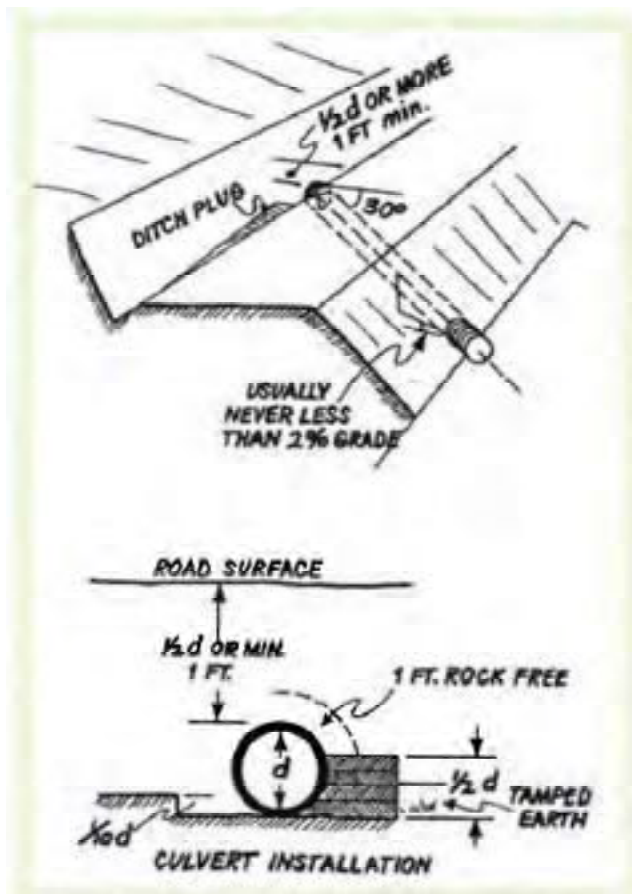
The elements of a properly installed ditch relief culvert. The culvert is angled at about 30 degrees to the road alignment to help capture flow and prevent culvert plugging or erosion of the inlet area. It is set at the base of the fill (ideally) or with a grade slightly steeper than the grade of the contributing ditch (but never with a grade less than 2 percent) (USDA-SCS, 1983). At a minimum, the grade of the ditch relief culvert should be sufficient to prevent sediment accumulation at the inlet or deposition within the culvert itself (it should be self-cleaning) (USDA-SCS, 1983).
